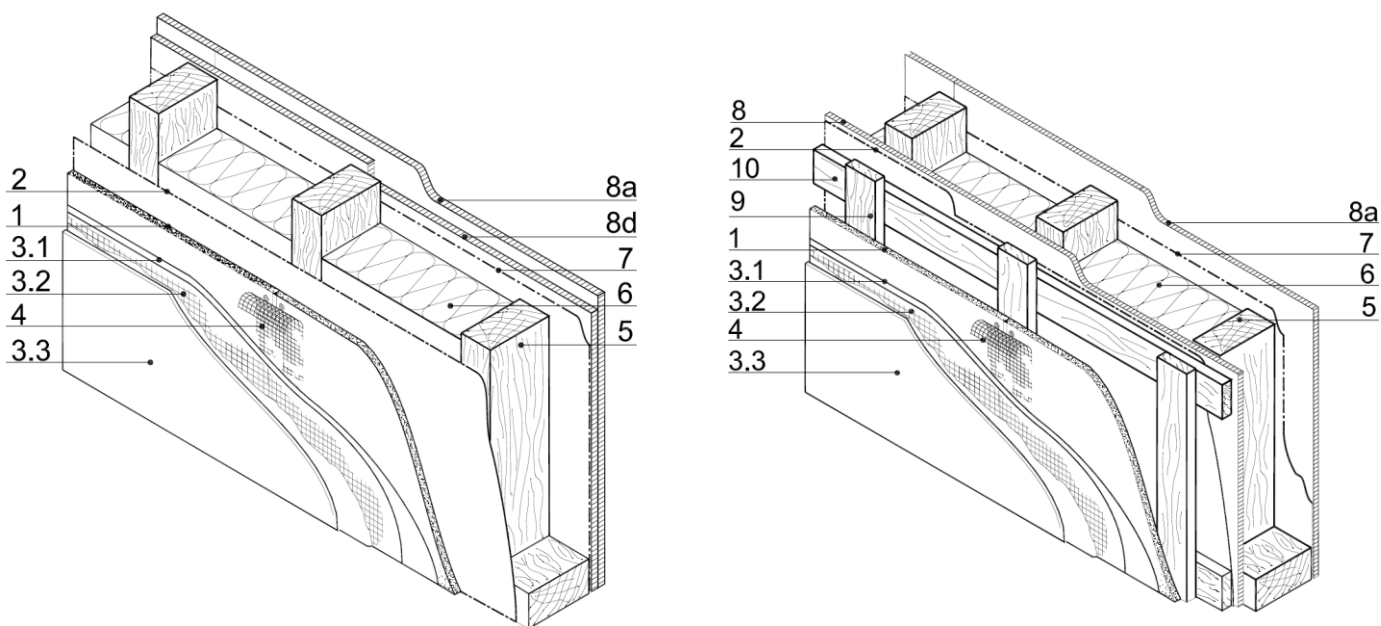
External wall with direct fastening of plates to wood frame:
